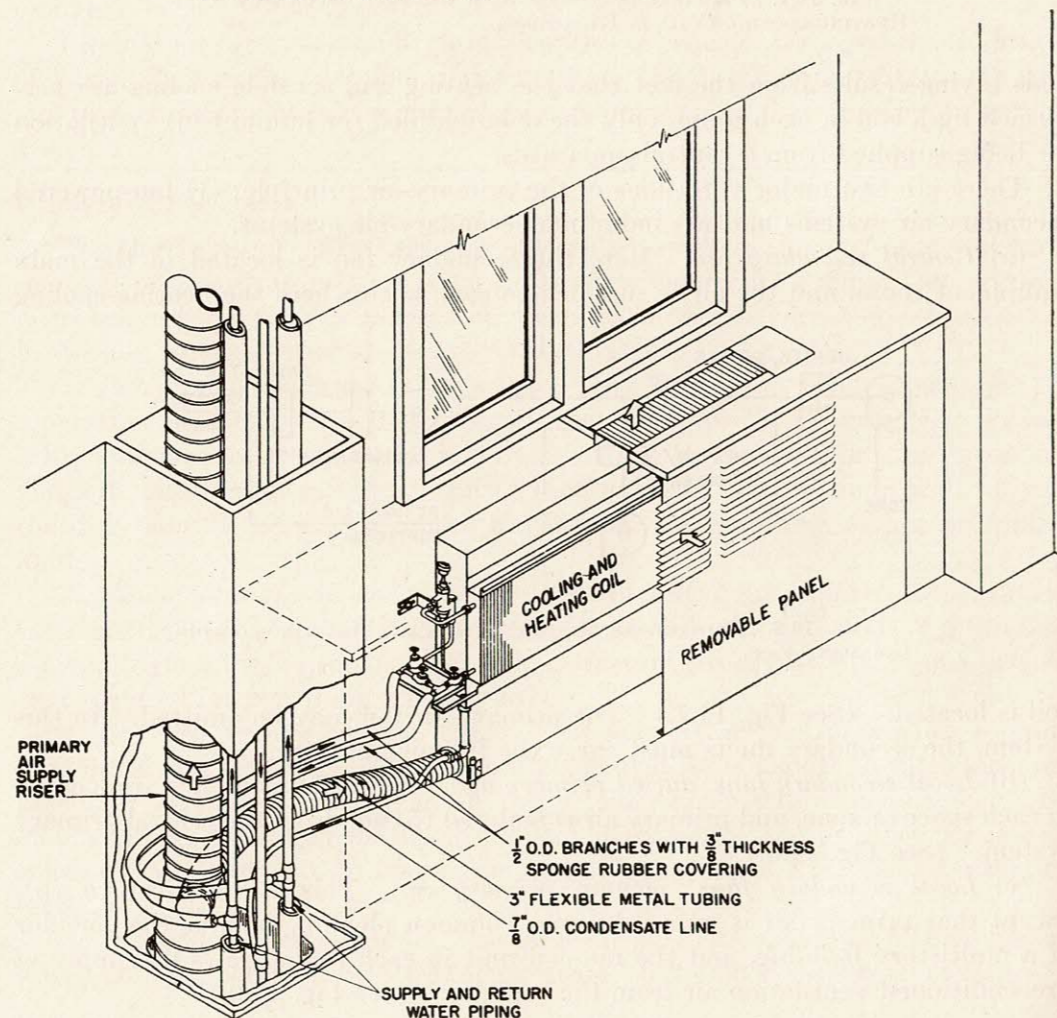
AIR AND WATER PIPING DETAIL—CARRIER CONDUIT WEATHERMASTER SYSTEM.
